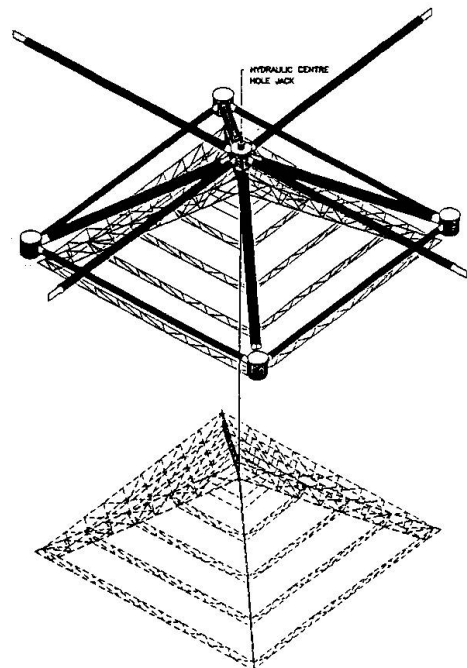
ERECTION OF SECONDARY ROOF STRUCTURE
